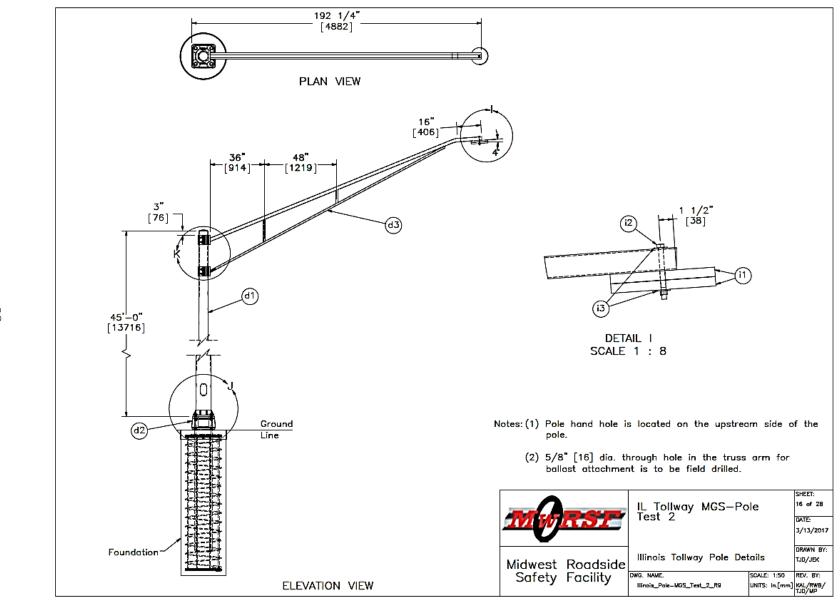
Illinois Tollway Pole Details, Test No. ILT-2
